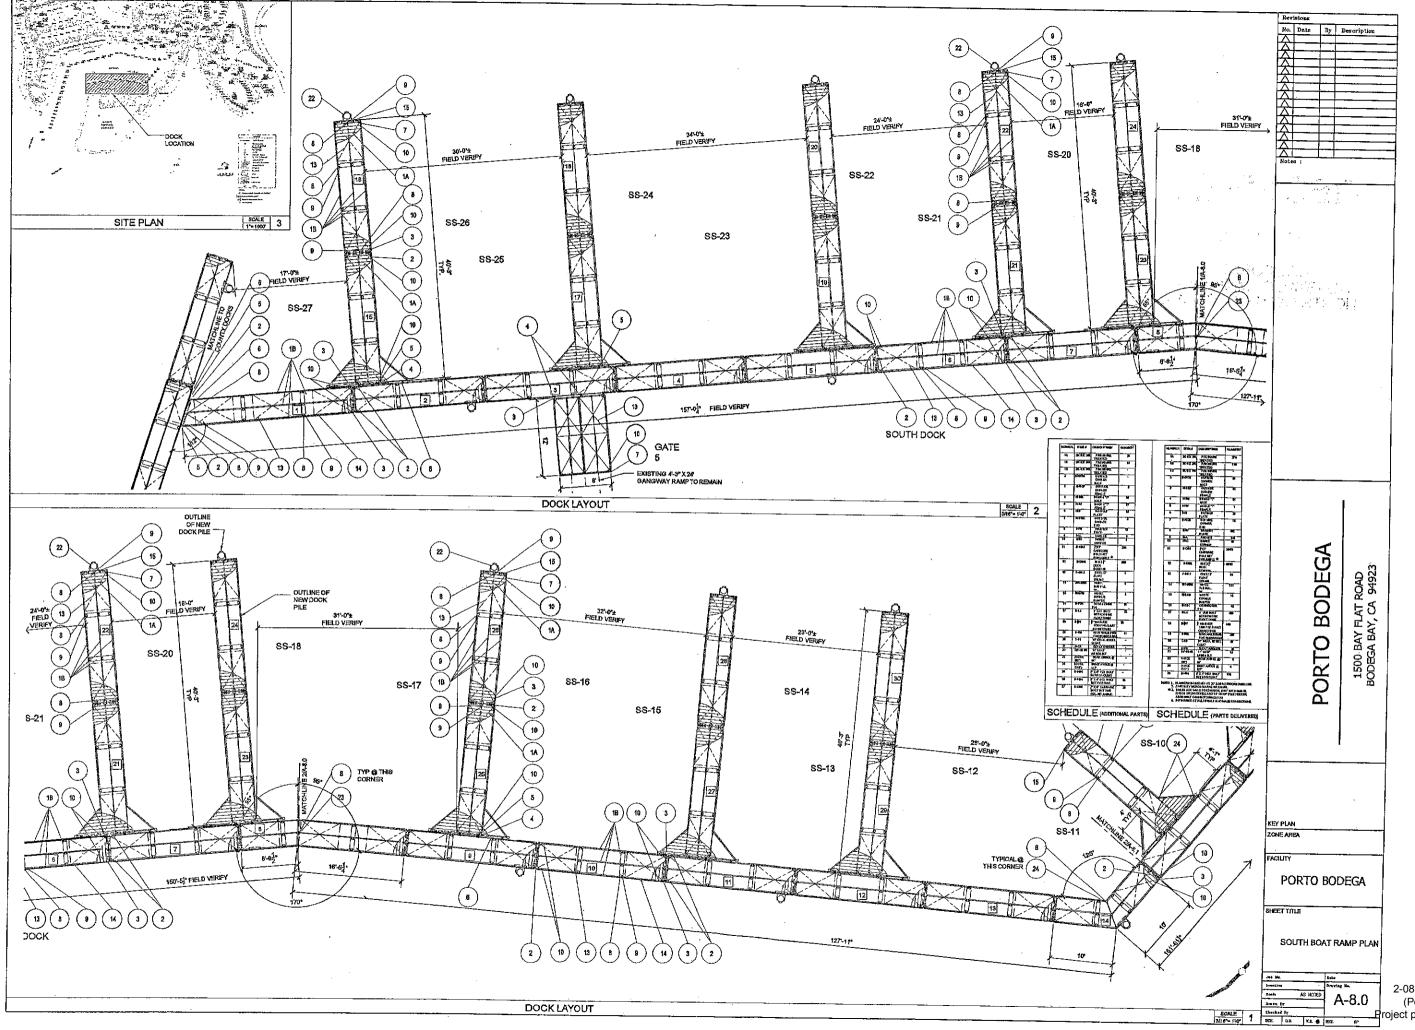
2-08-013 & 2-10-030 (Porto Bodega LP) oject plans and photos Page 2 of 14
